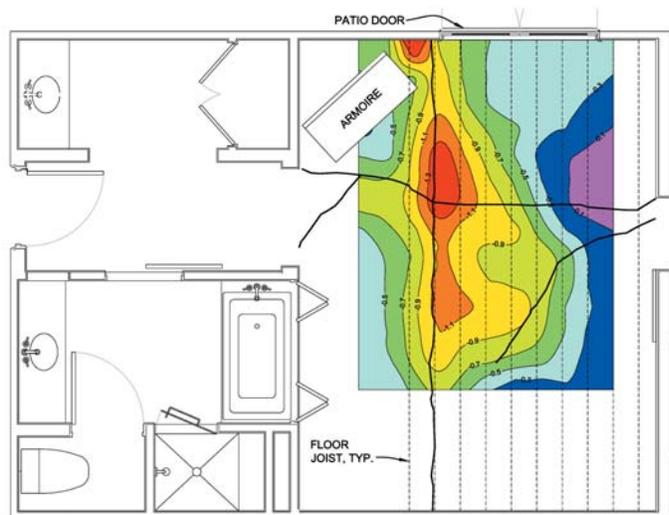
Crack map, floor level contour map and floor joist locations superimposed on guest room floor plan.
